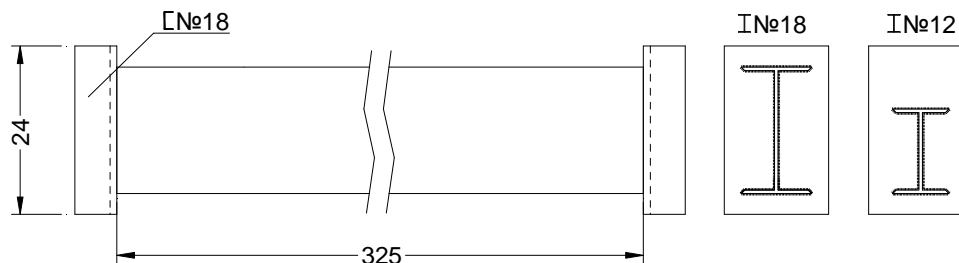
Anchoring the ends of experienced rigid reinforcement beams
